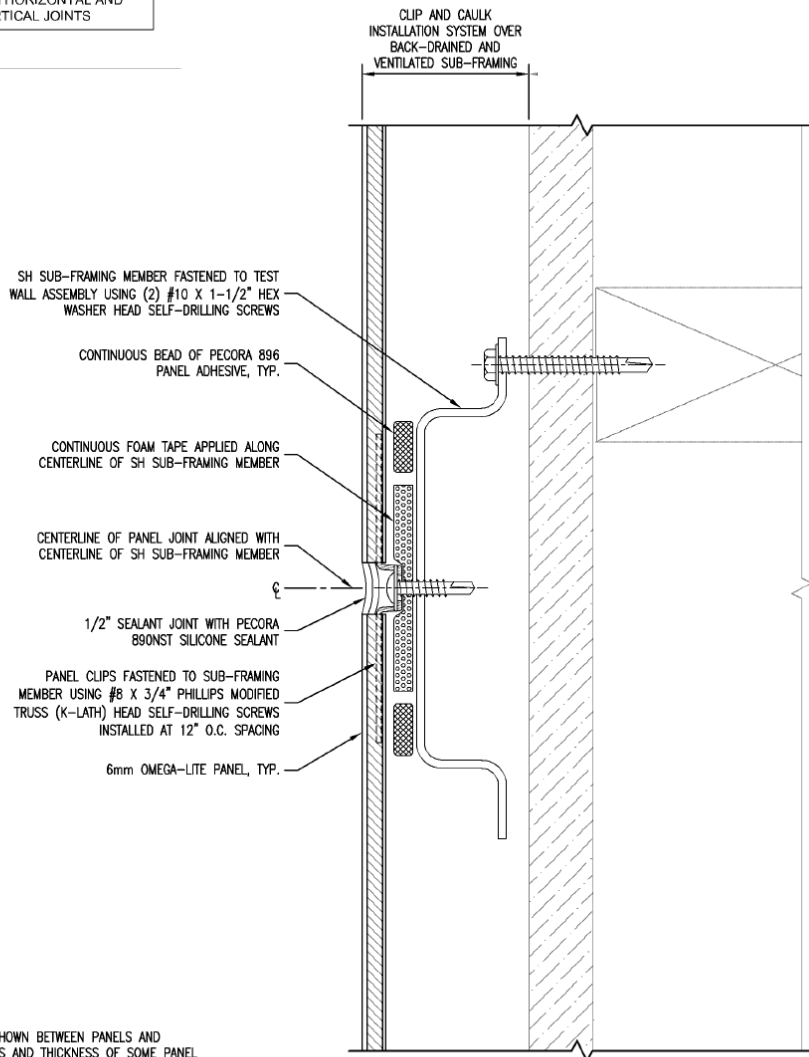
CLIP & CAULK INSTALLATION SYSTEM WITH HORIZONTAL LAYOUT OF BD&V SUB-FRAMING OVER GYPSUM SHEATHING
